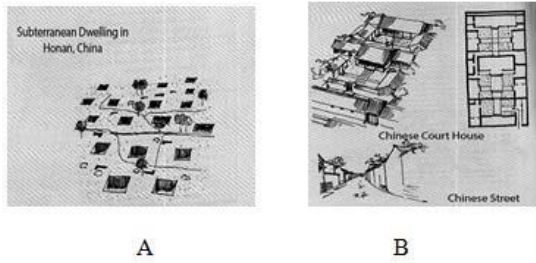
(A-B) Typical layout of Chinese dwelling and courtyard houses (Schoenauer, 1962).
